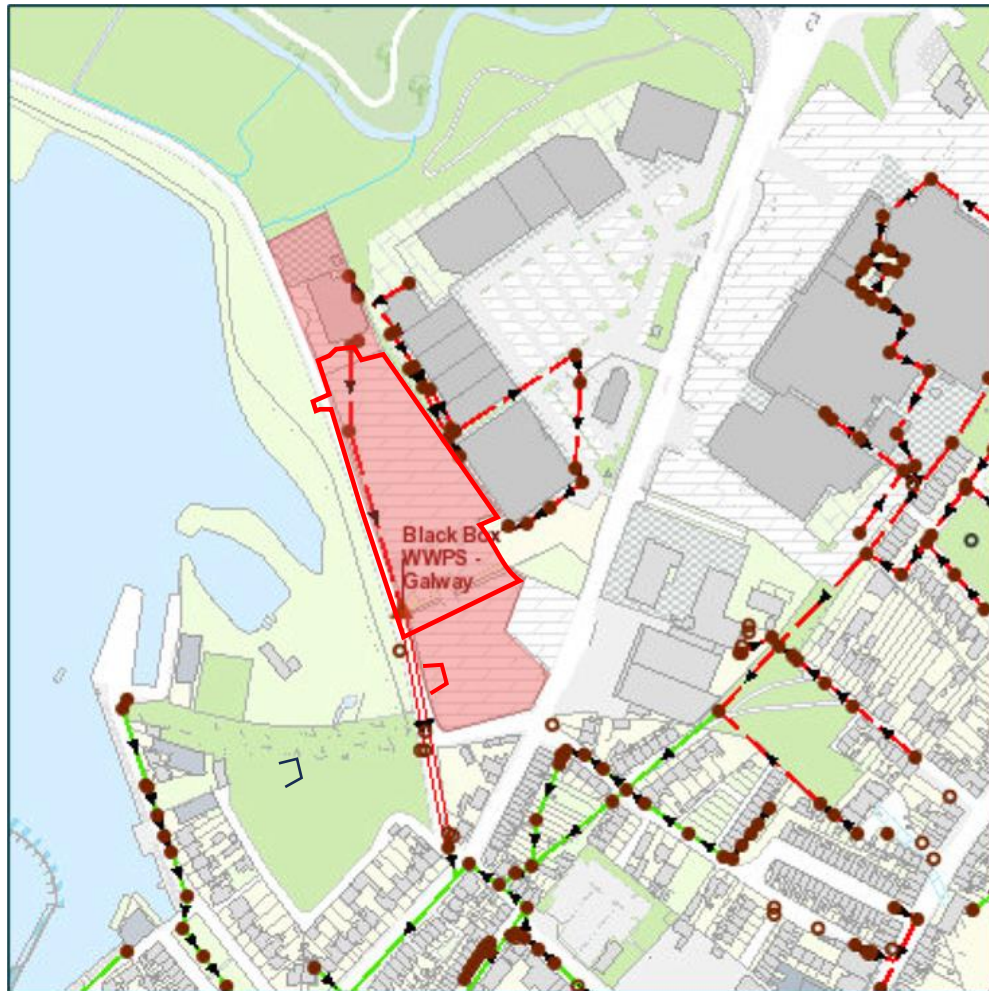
Existing Foul Water Infrastructure, UÉ 2024
